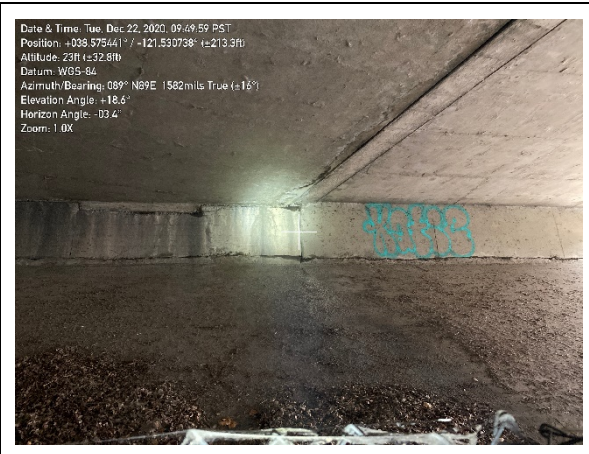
Potentially suitable bat roost habitat consists of concrete girder bridge construction with multiple expansion joints and some crevices observed along the bridge abutments. Bat guano was observed in crevices along the bridge abutment (Location #35). Taken facing northeast.
